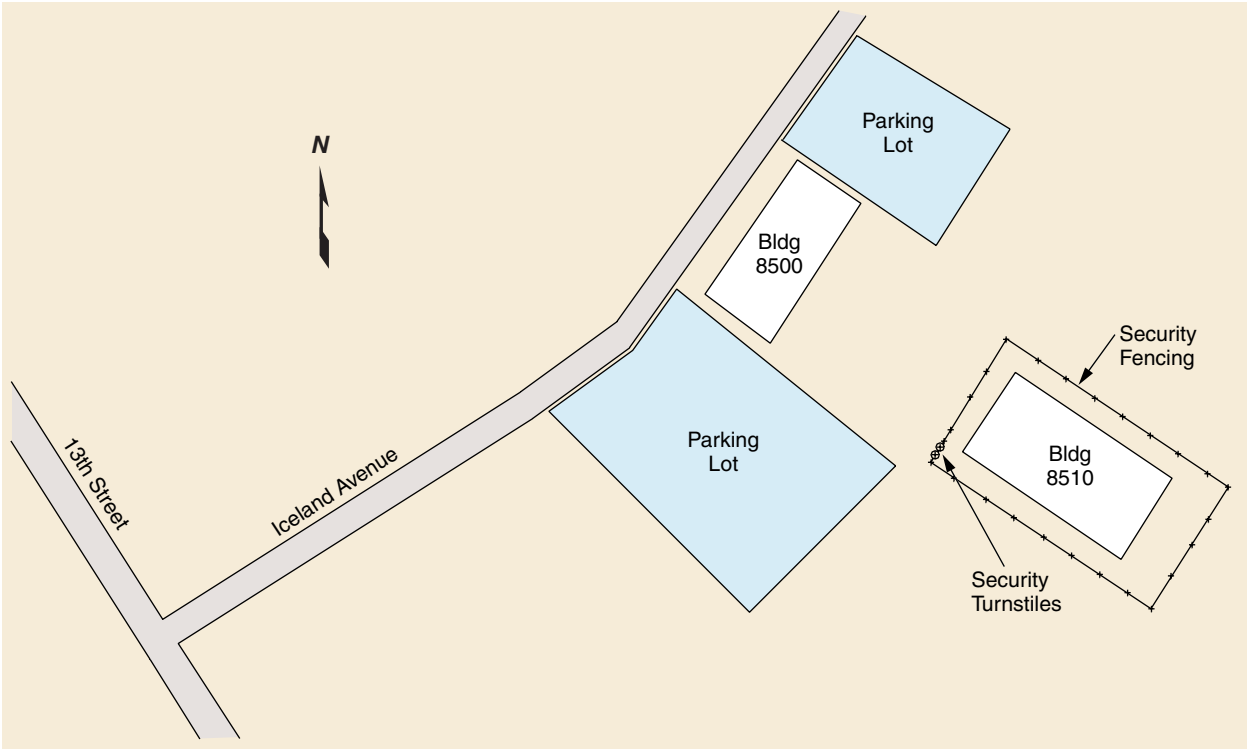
Launch Control Center (Building 8510) Site Plan
